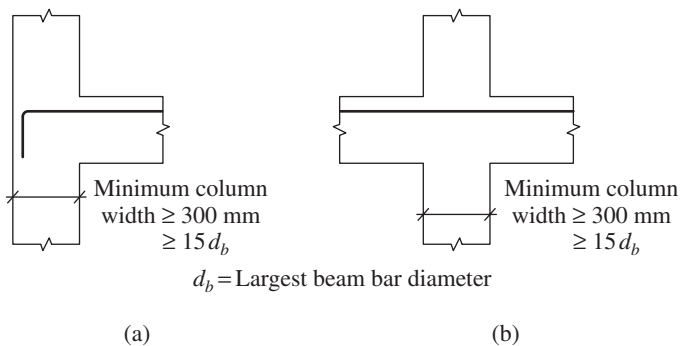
Minimum width of columns in earthquake zones (a) Exterior column (b) Interior column
